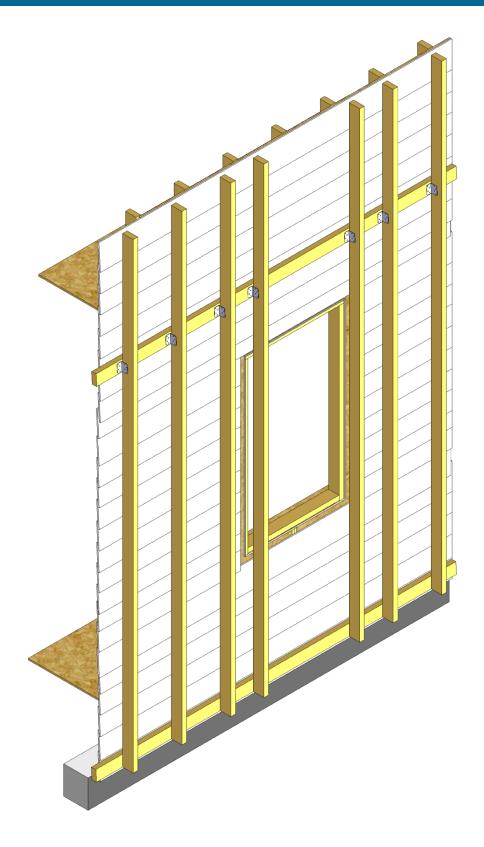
Step 4: Install the vertical 2 \times 4s, spaced as needed based on structural calculations and siding manufacturer requirements.
